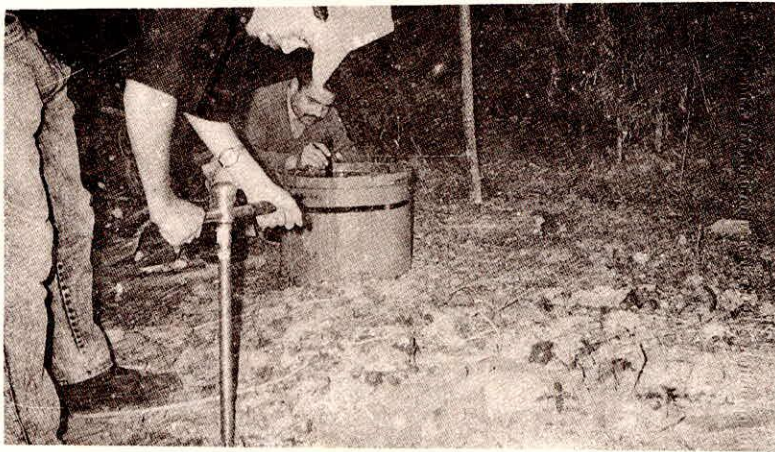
Infiltration Test & Soil Sampling at Sarangma Bridge Side
